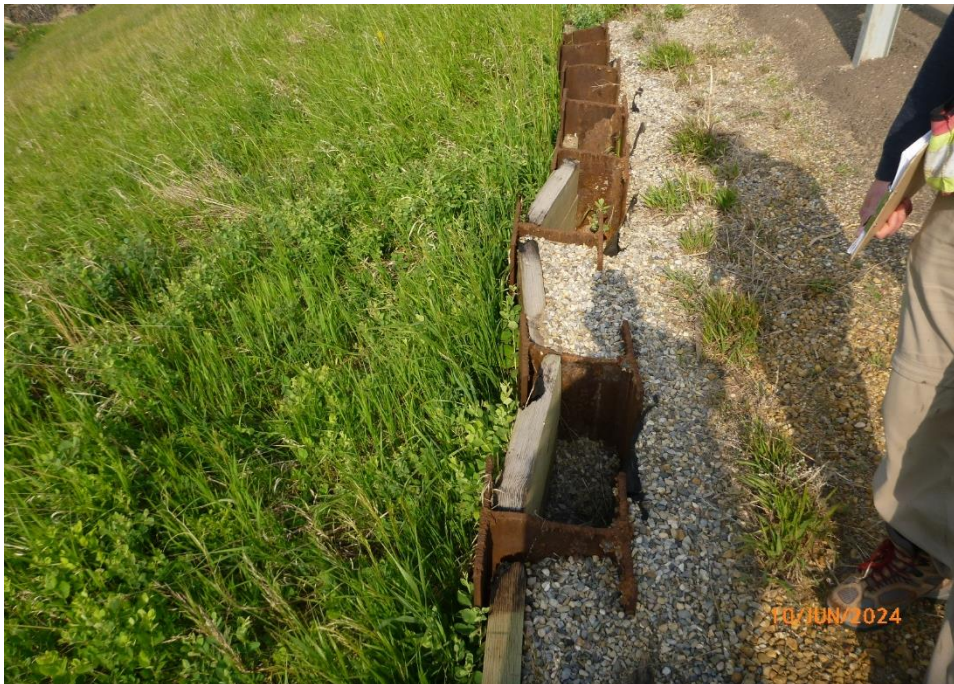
The upper H-pile wall has continued to deflect since the 2023 inspection. Photo taken June 10, 2025 facing east.
